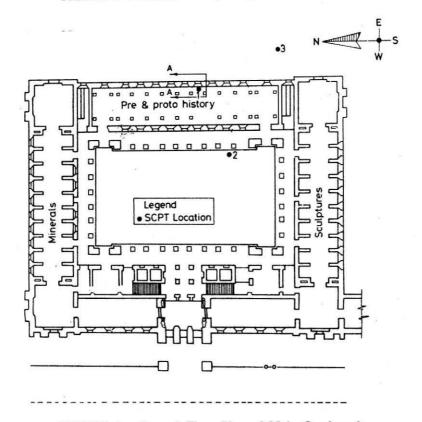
Ground Floor Plan of Main Quadrangle
